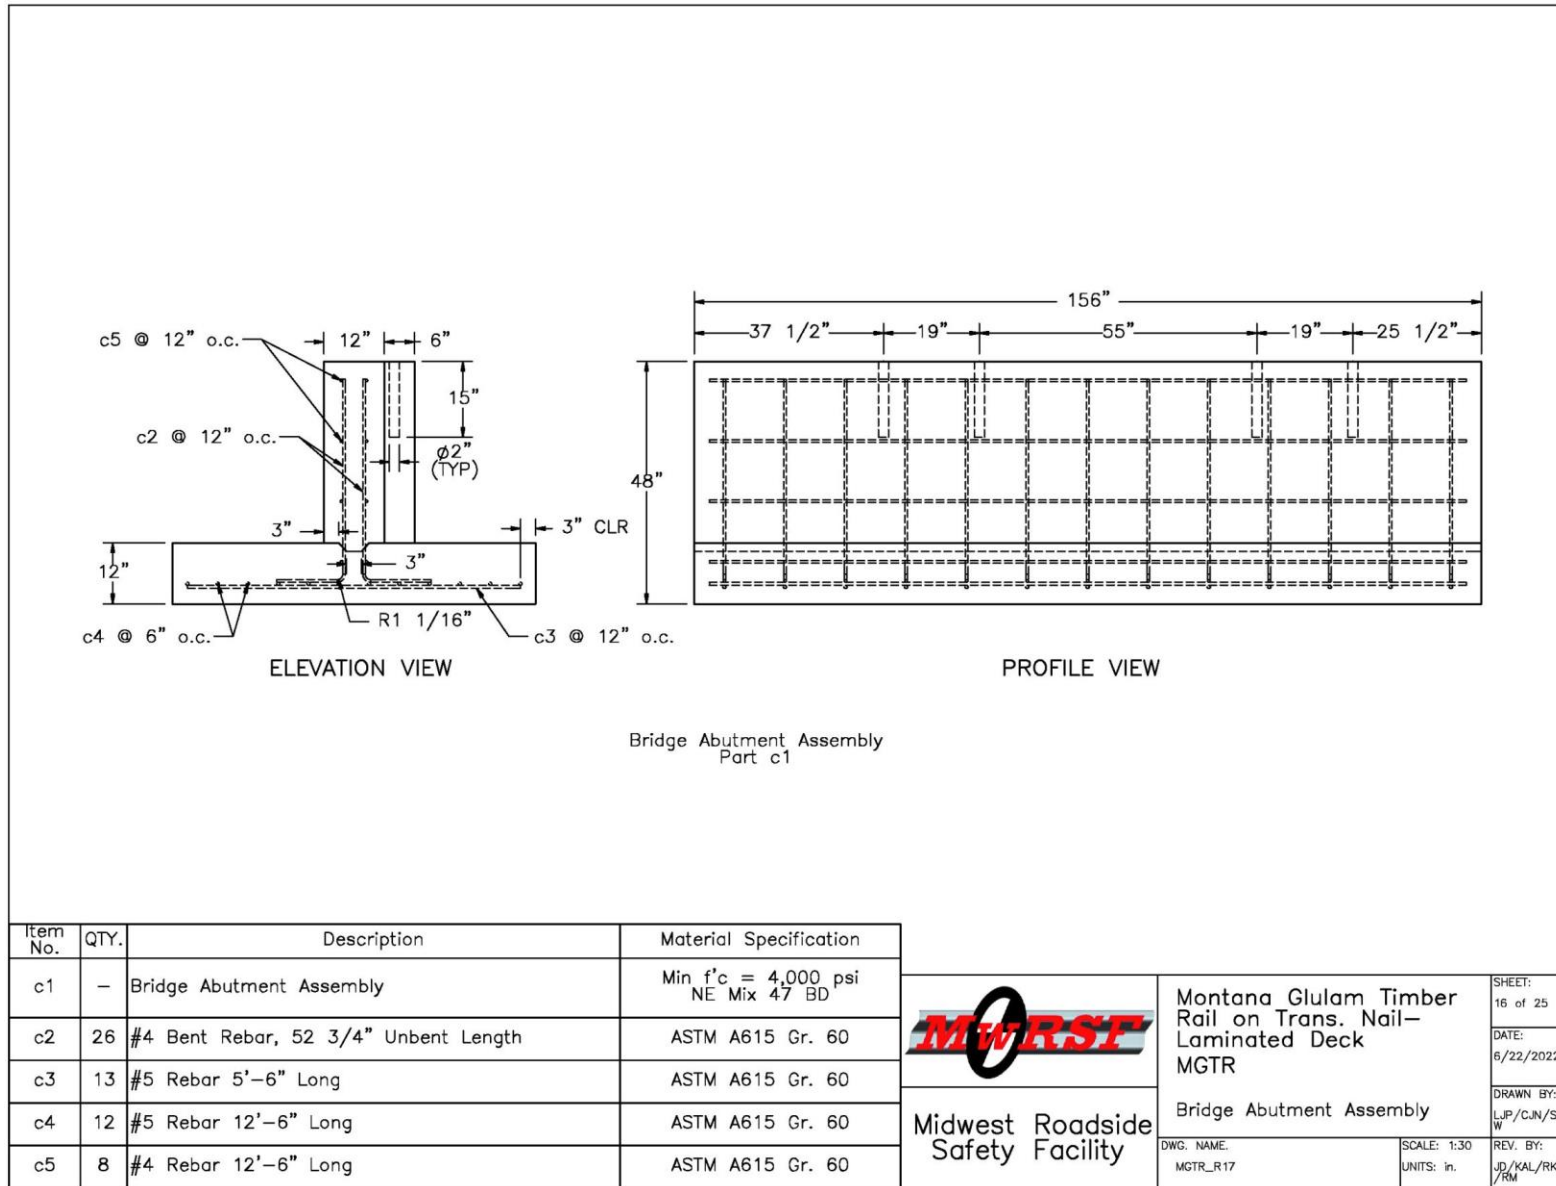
Bridge Abutment Assembly, Test Nos. MGTR-1S and MGTR-1D
